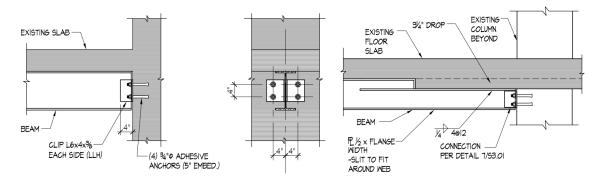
Steel Beam to Existing Concrete Beam of Column Typical Detail (Left) and to Column at Drop Panel (Right),7 & 15 on S/3.01
